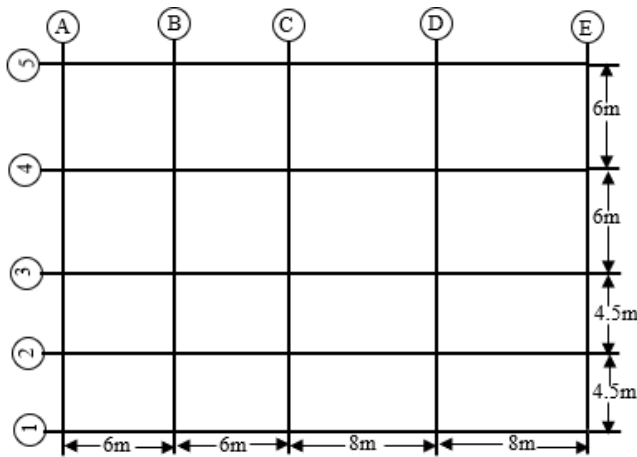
Floor plan of MI-8, MI-4, MI-1, and MI-S
